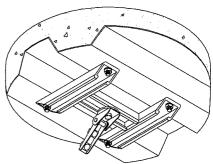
(4) BOLT ATTACHMENT WITH SLDB-4000
